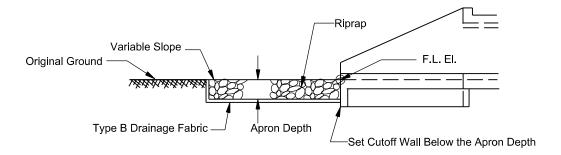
A — RIPRAP APRON AT BOX CULVERT OUTLET
